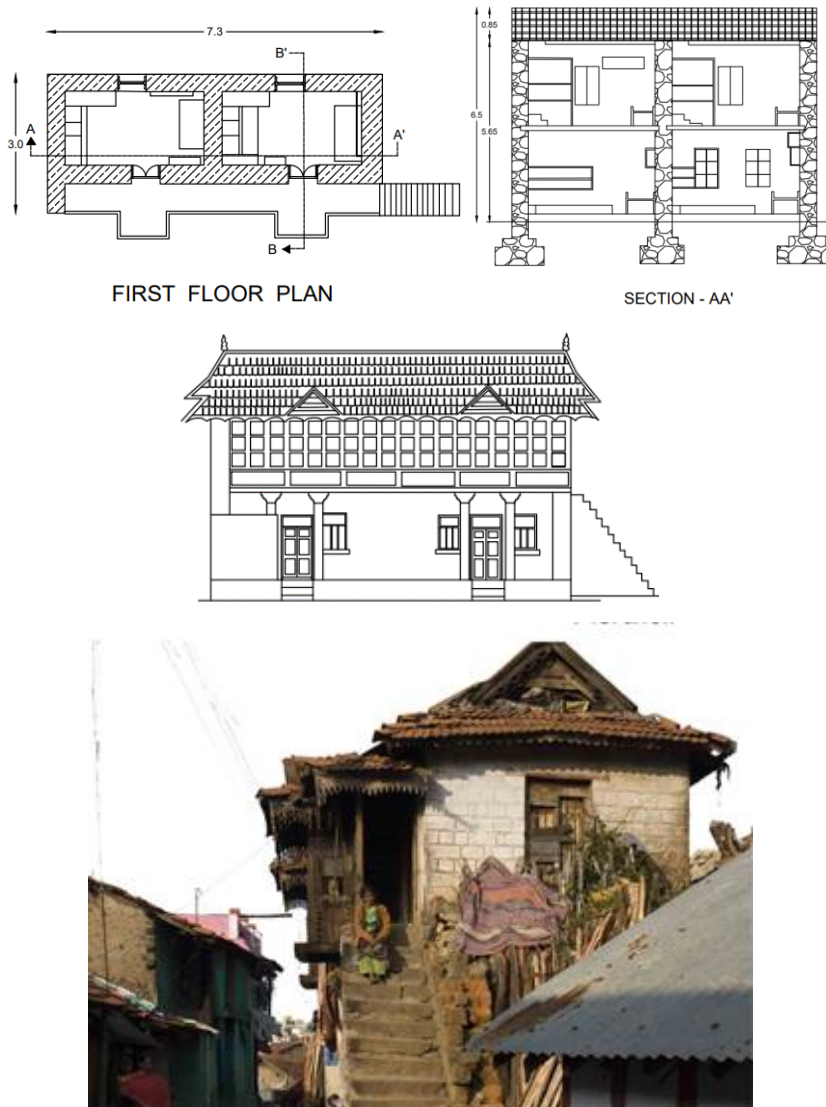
Floor Plan,Section and elevation of Stone house of Poombharai
